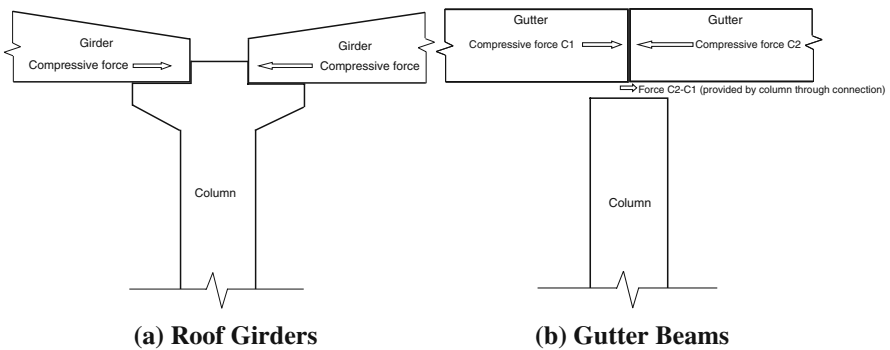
Compressive forces in roof girders and gutter beams (viewed from side)
